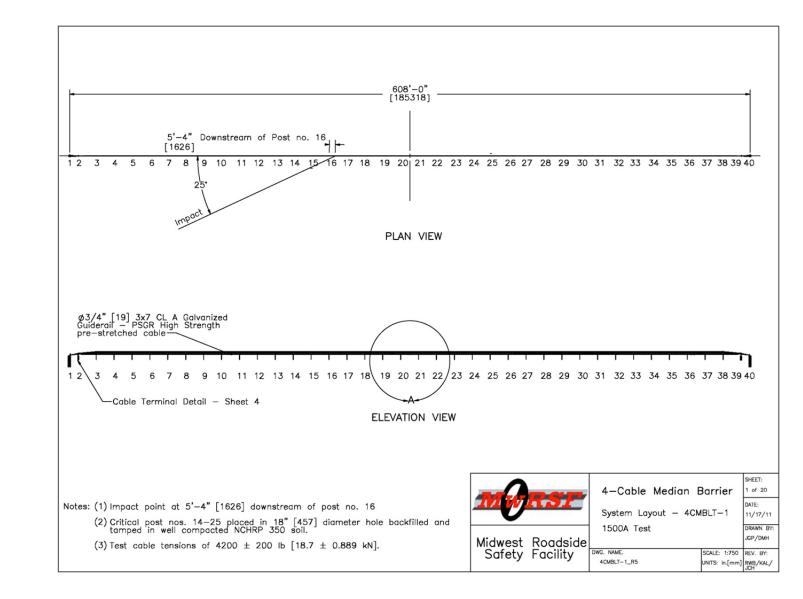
Test Installation Layout, Test No. 4CMBLT-1
